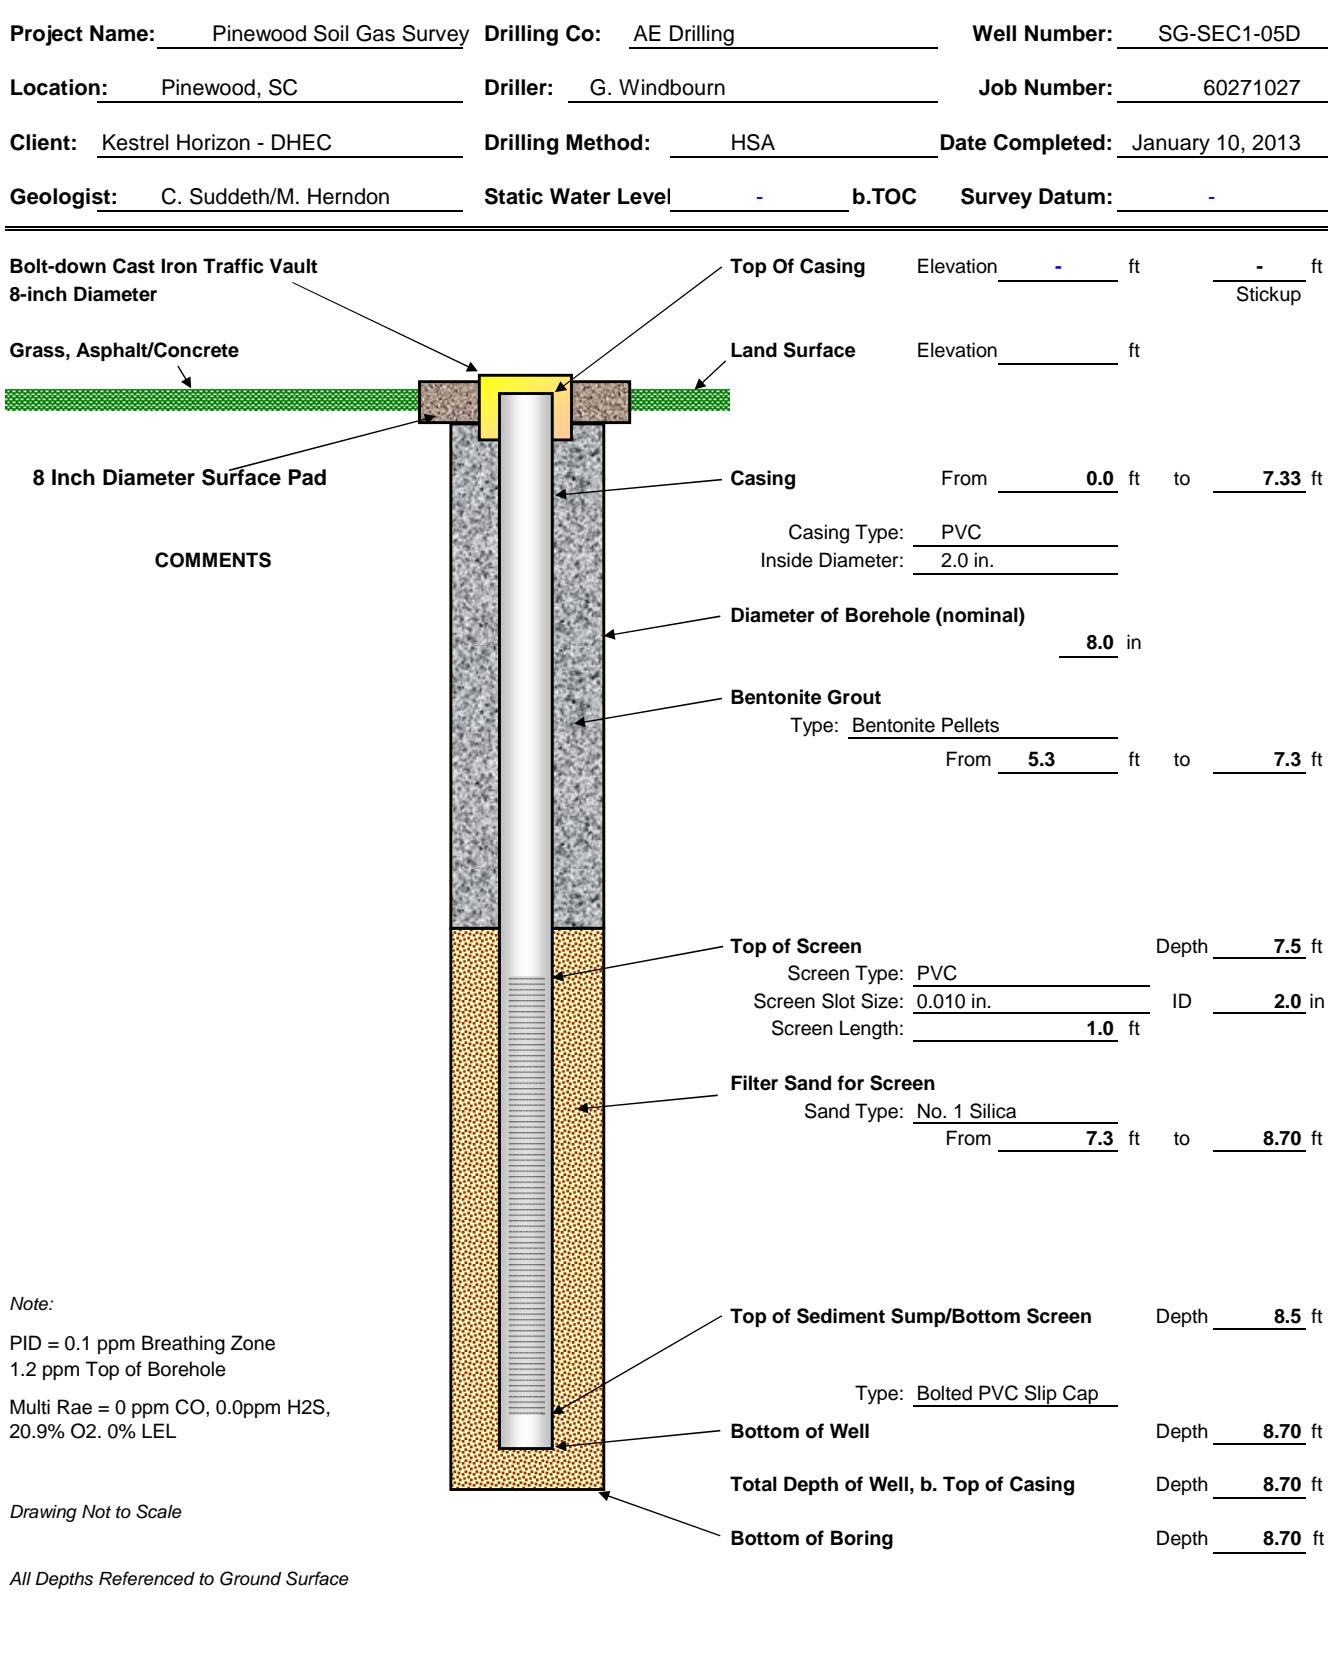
Soil Gas Survey Monitoring Point Installation Details
